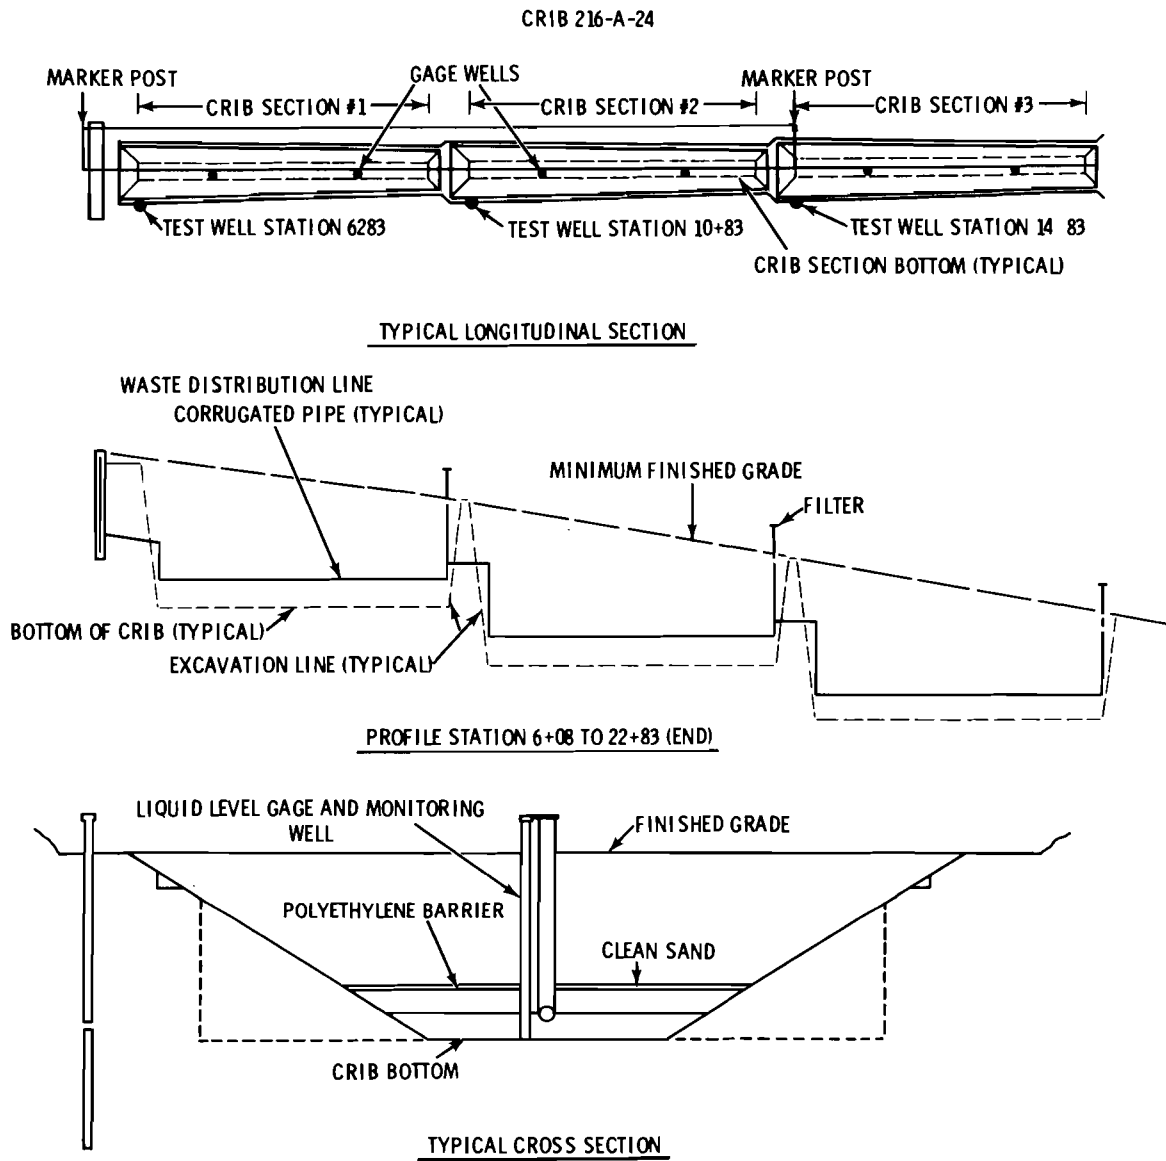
Structural Details of the 216-A-24 Crib
